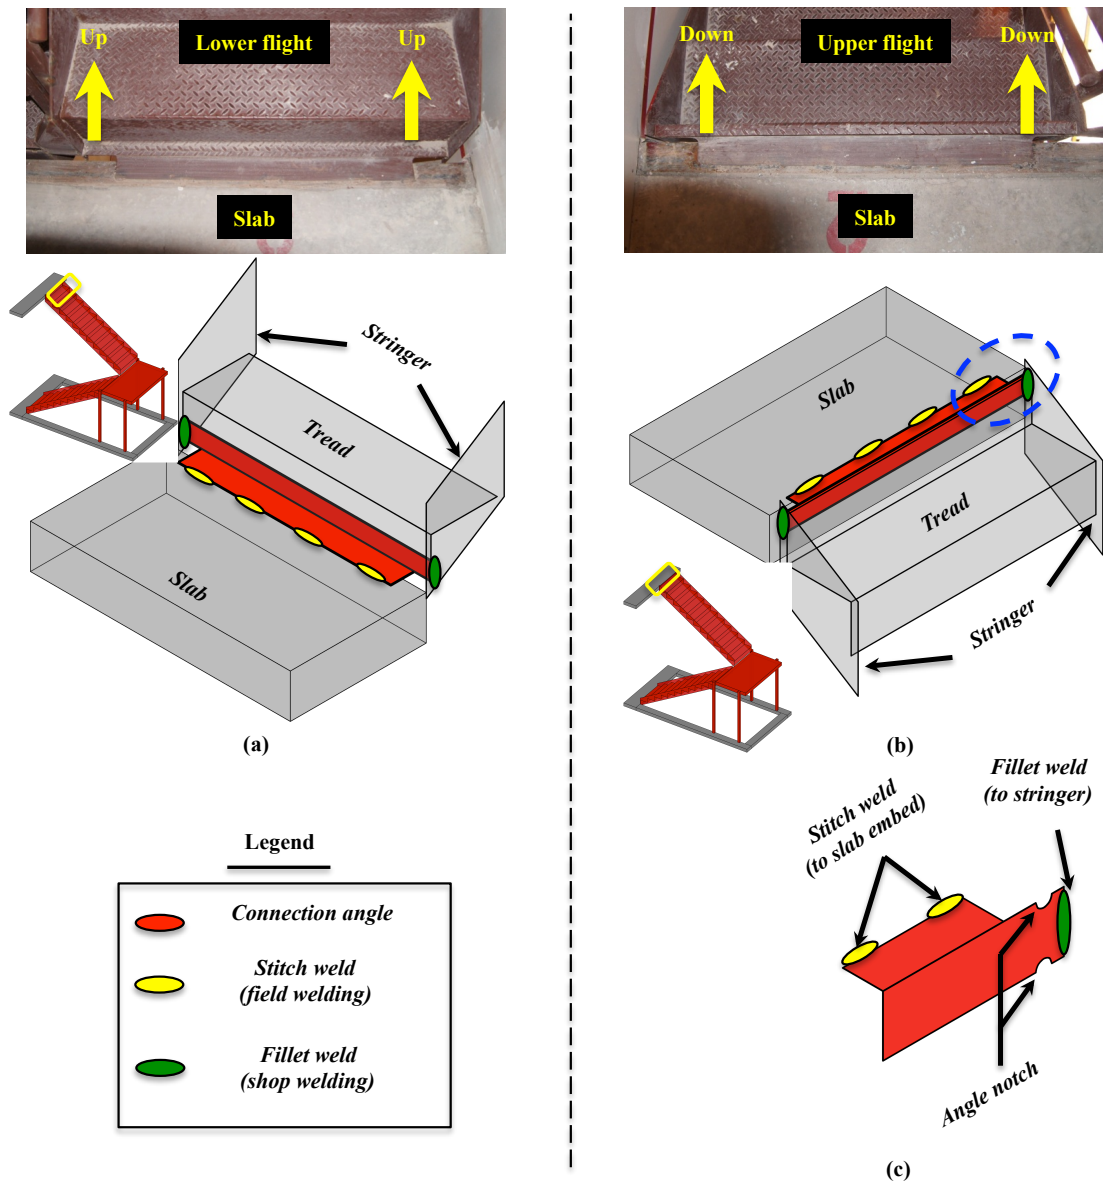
Flight-to-building connection details: (a) lower flight to slab connection, (b) upper flight to slab connection, and (c) upper flight connection angle.
